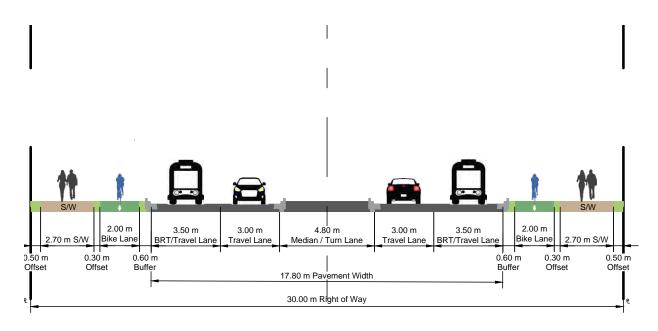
Cross-section through North-South Arterial Road prepared by BA Group
